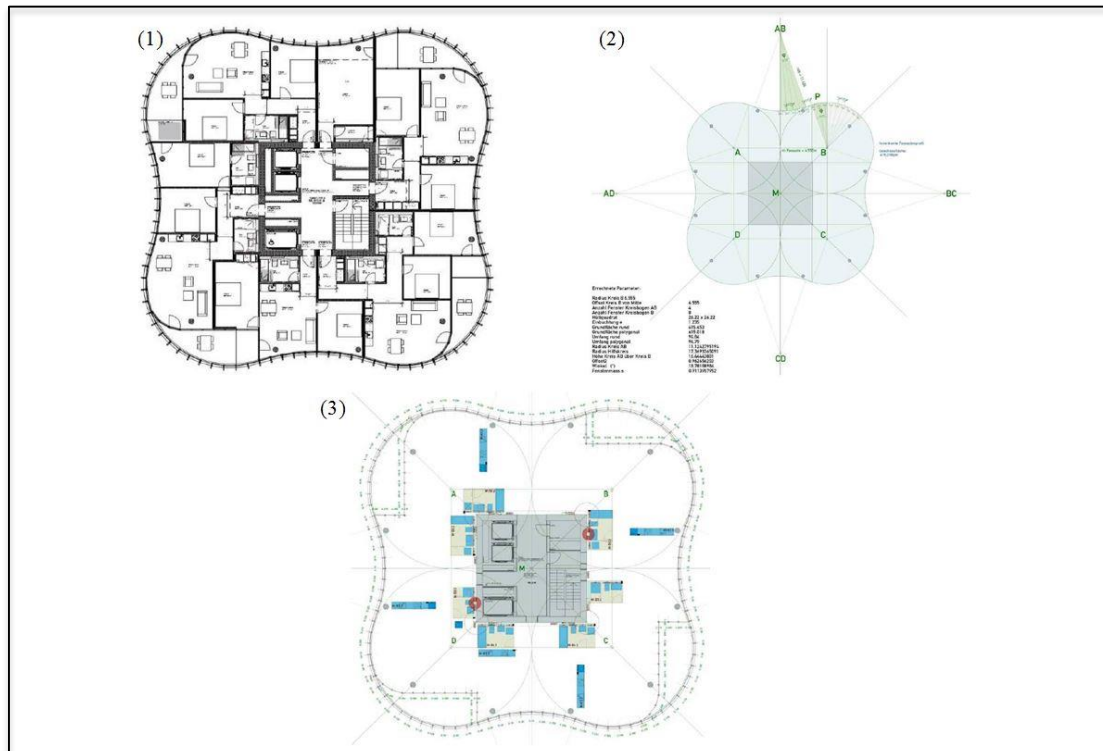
Example for modularization building plan with planning basis (1), project coordinate system (2) and module technology plan (3) (Figure p. 26, 28 and 32 in Hovestadt 2014, Digitales Bauen GmbH, Germany)
